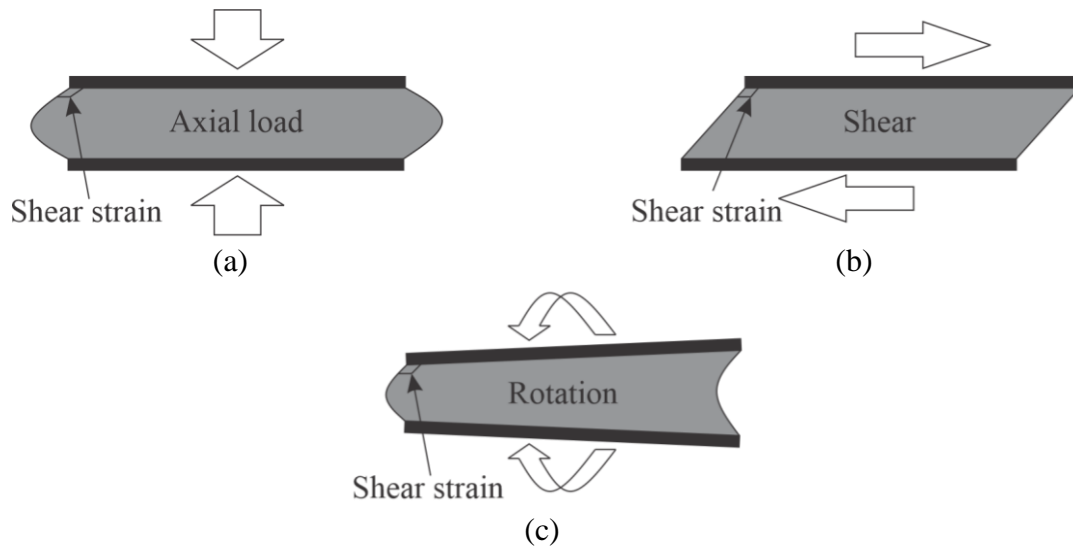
Shear strain in bearing pad due to: (a) axial load; (b) shear; (c) rotation
